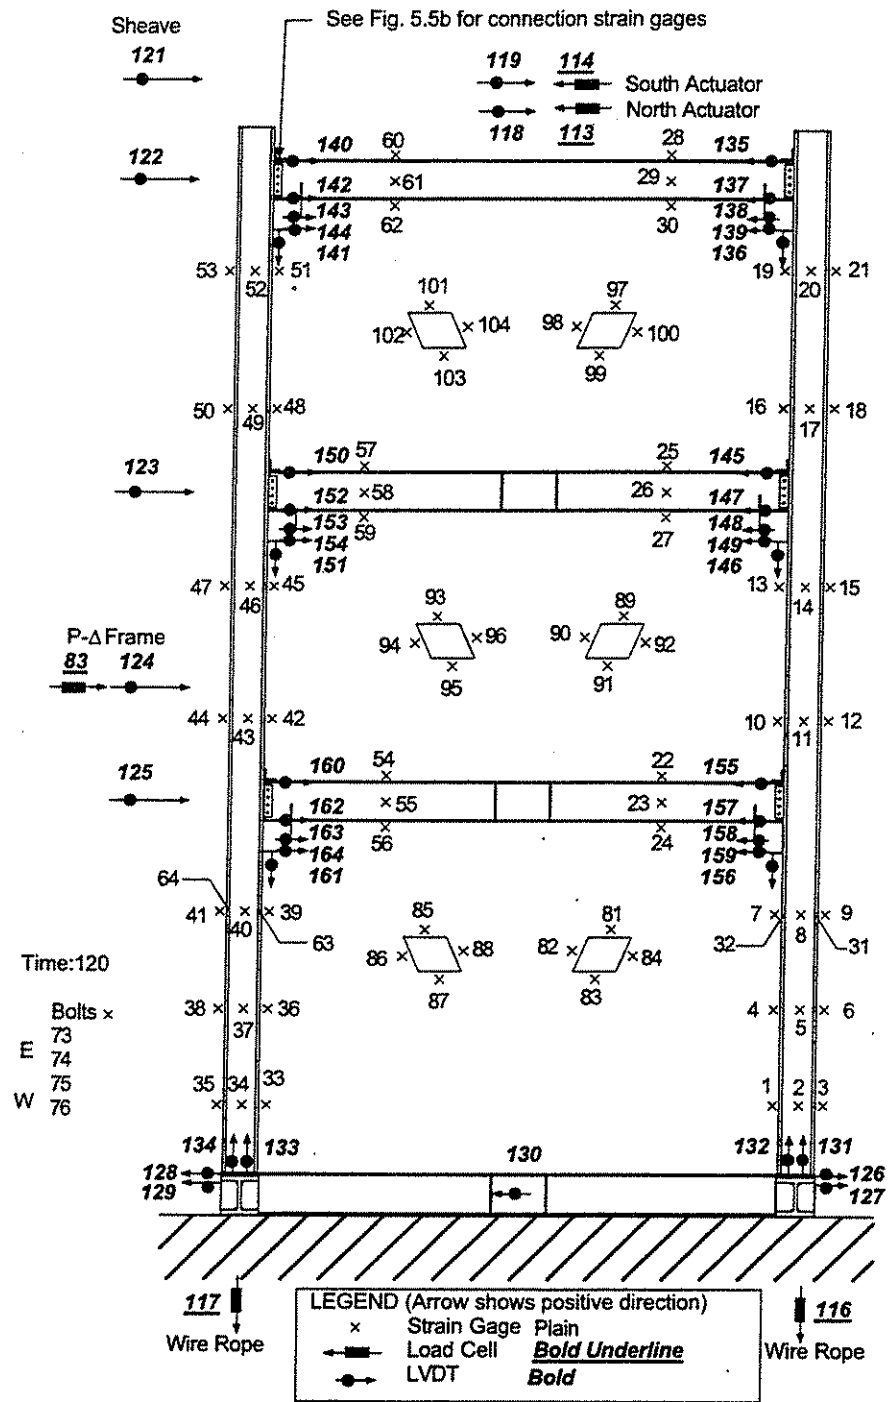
Instrumentation layout and channel identification for VE-frame.
